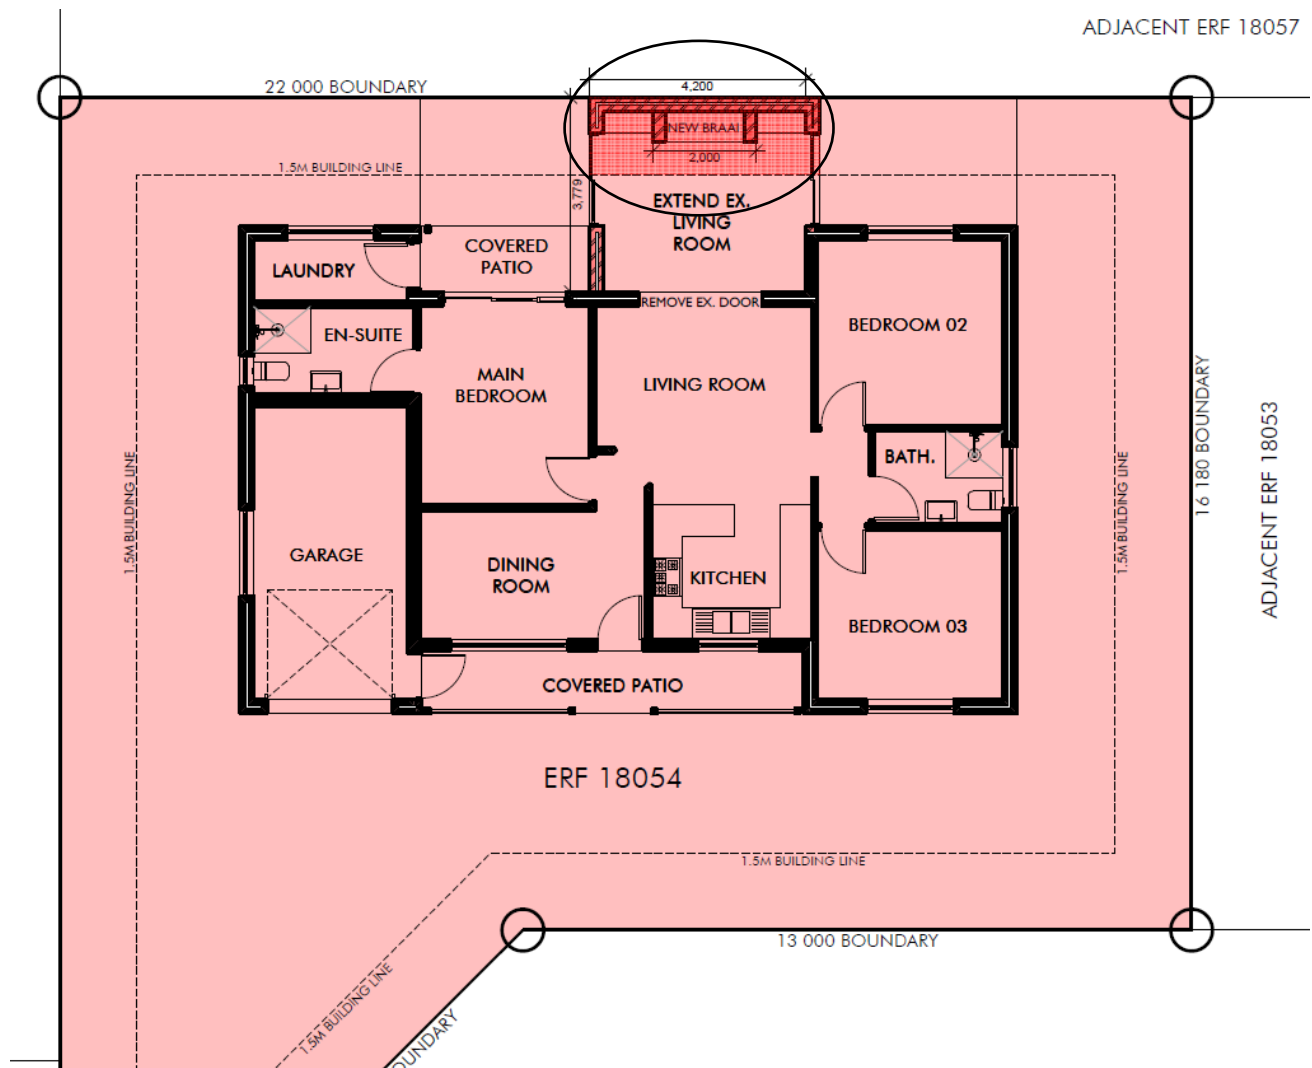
| SITE LAYOUT PLAN SHOWING AS-BUILT STRUCTURES AND ENCROACHMENT
